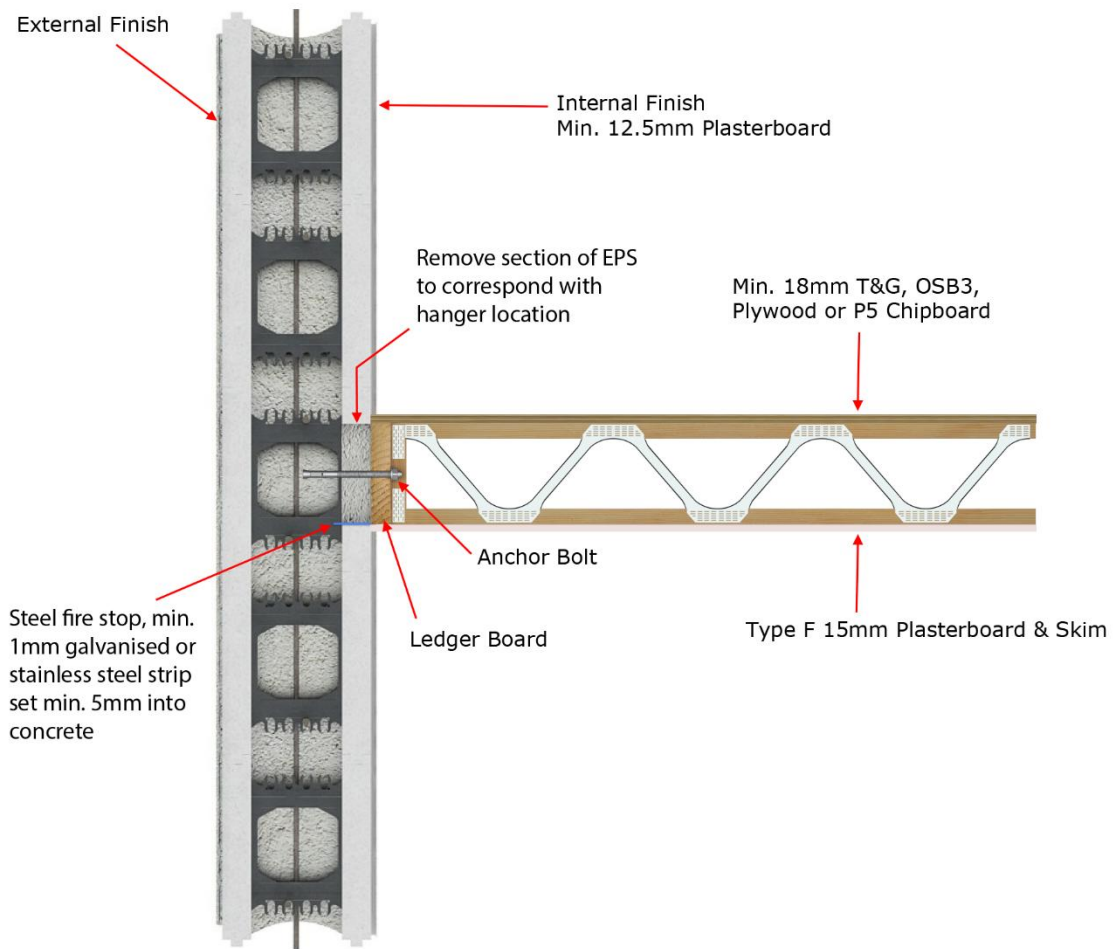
Ledger board anchor detail for open web (as illustrated) and solid joists.
